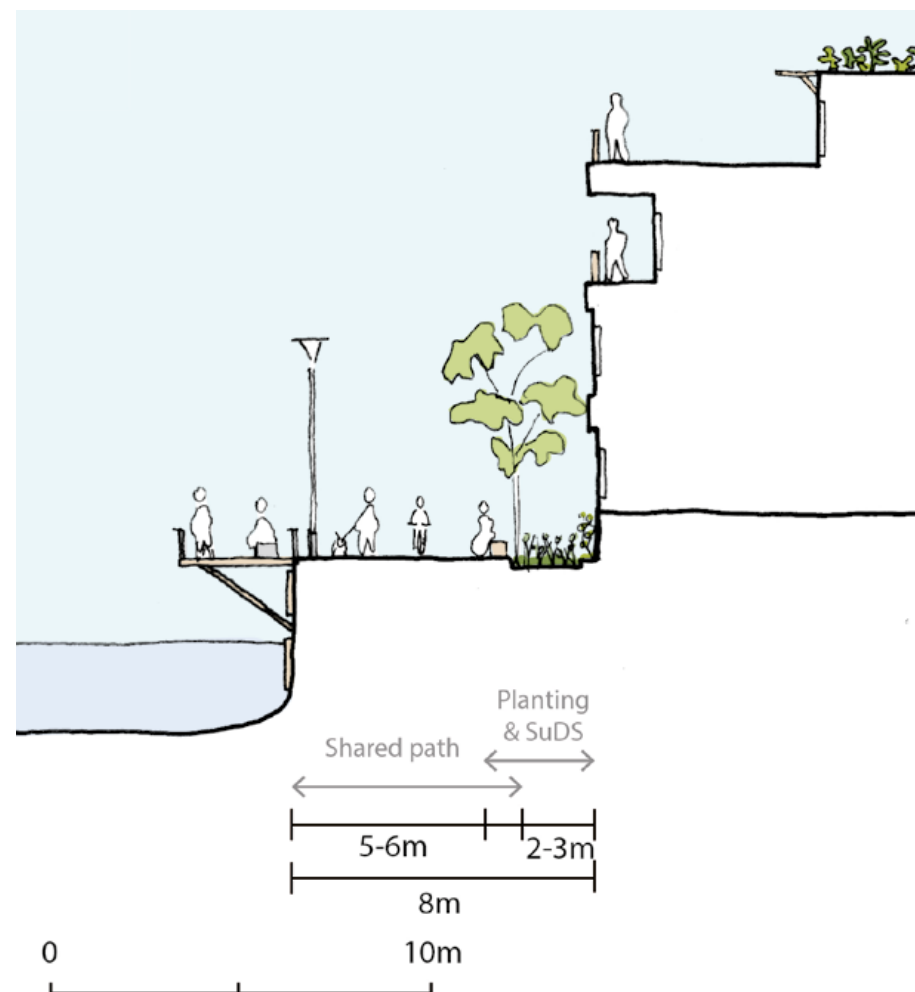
Indicative section through the waterfront route showing a cantilevered walkway, greened edges, tree planting and a wide shared walking and cycling path overlooked by new homes.
